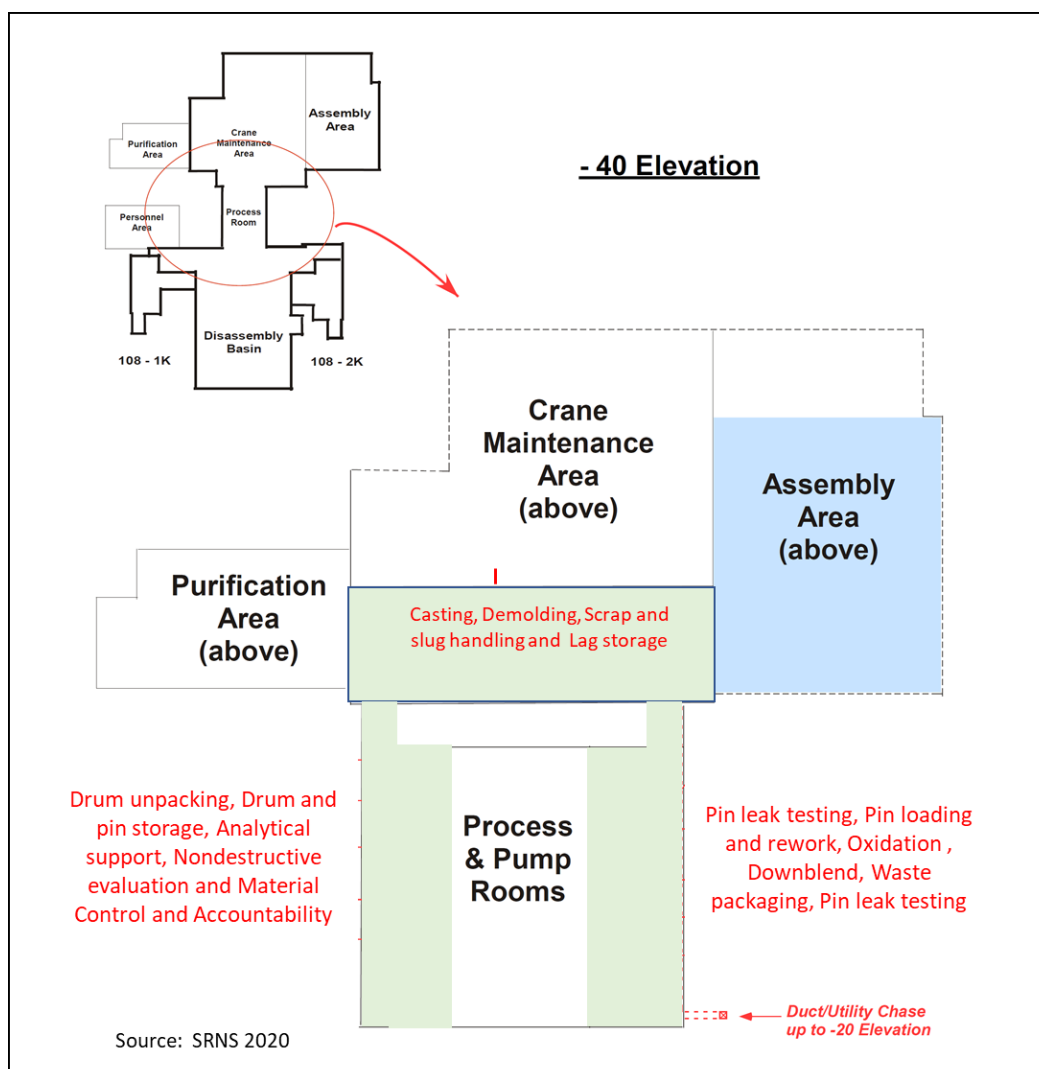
Savannah River Site Proposed Fuel Fabrication Facility Minus-40-Foot Level of K-Reactor Building
